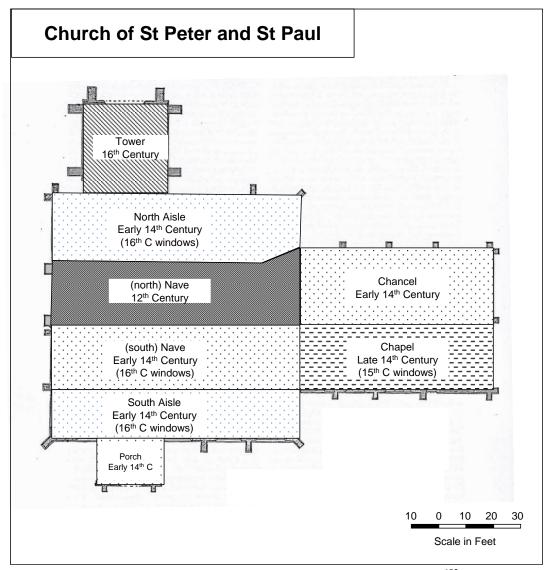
Plan of the Church of St Peter and St Paul in Wisbech. 652
